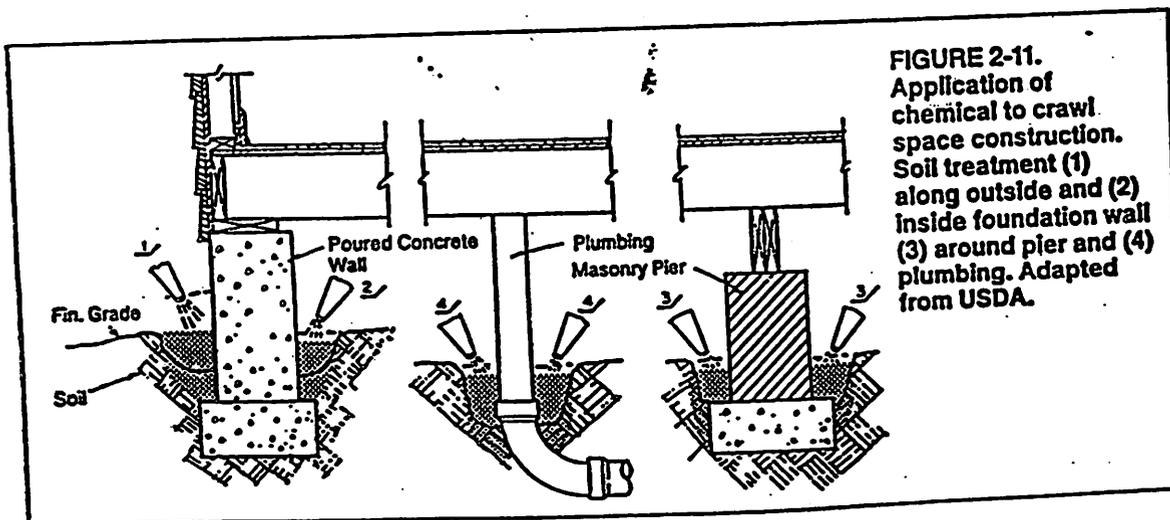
Application of chemical to crawl space construction. Soil treatment (1) along outside and (2) inside foundation wall (3) around pier and (4) plumbing. Adapted from USDA.
